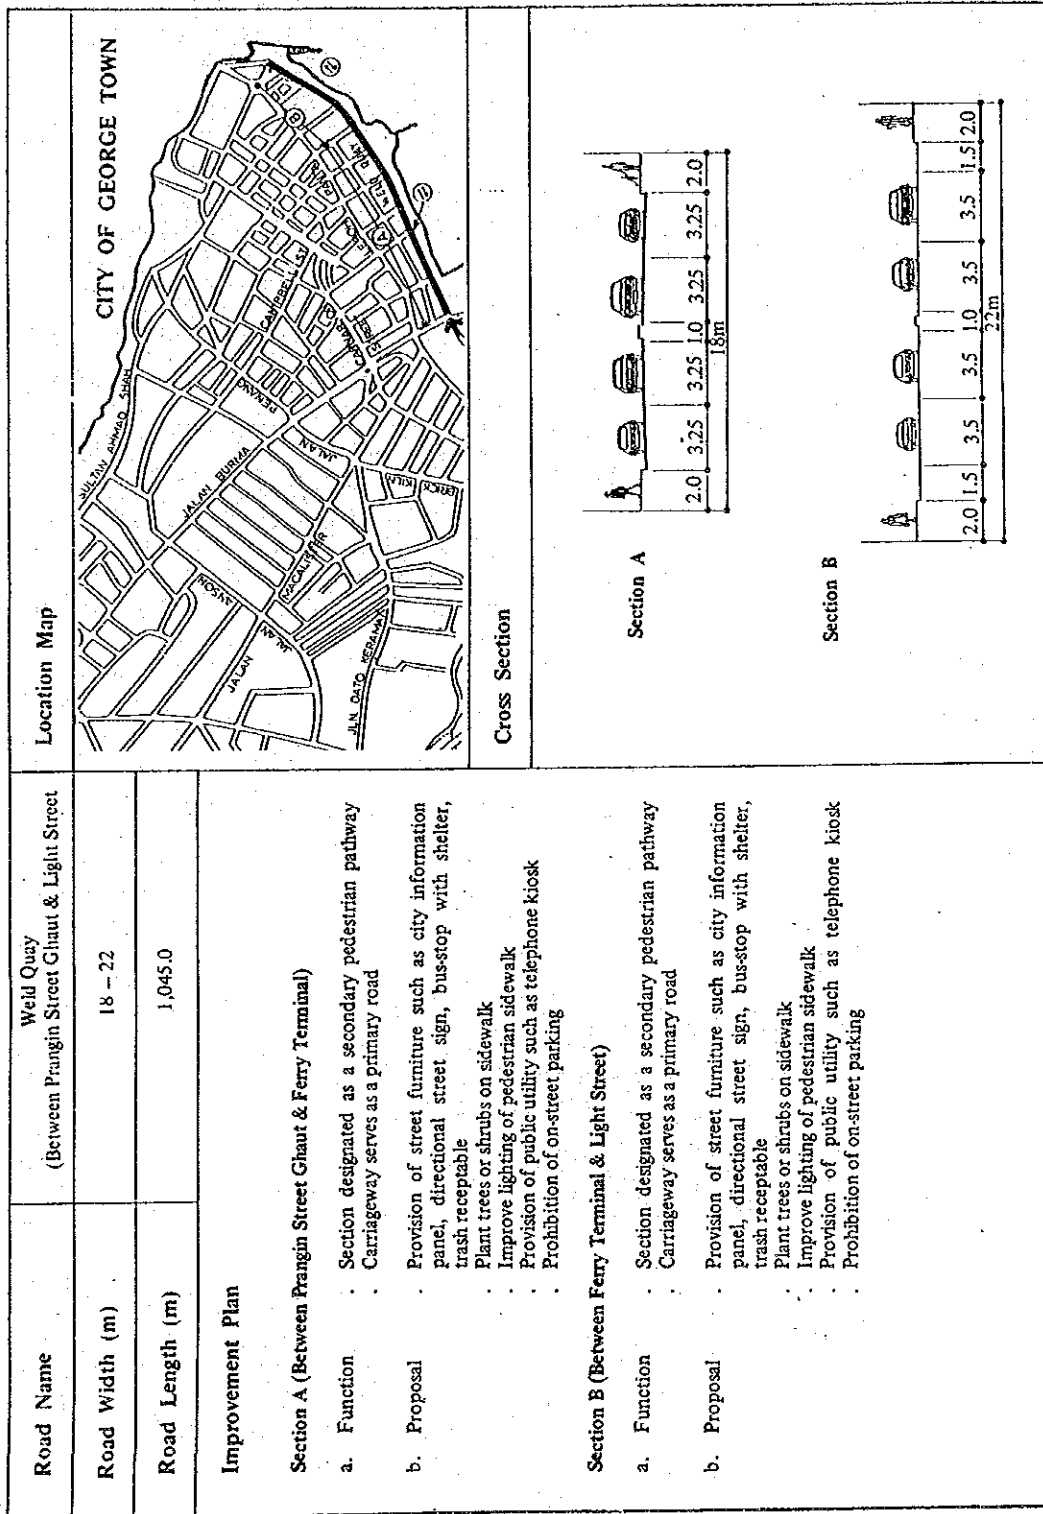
Pedestrianisation Improvement Plan (20) – Weld Quay
